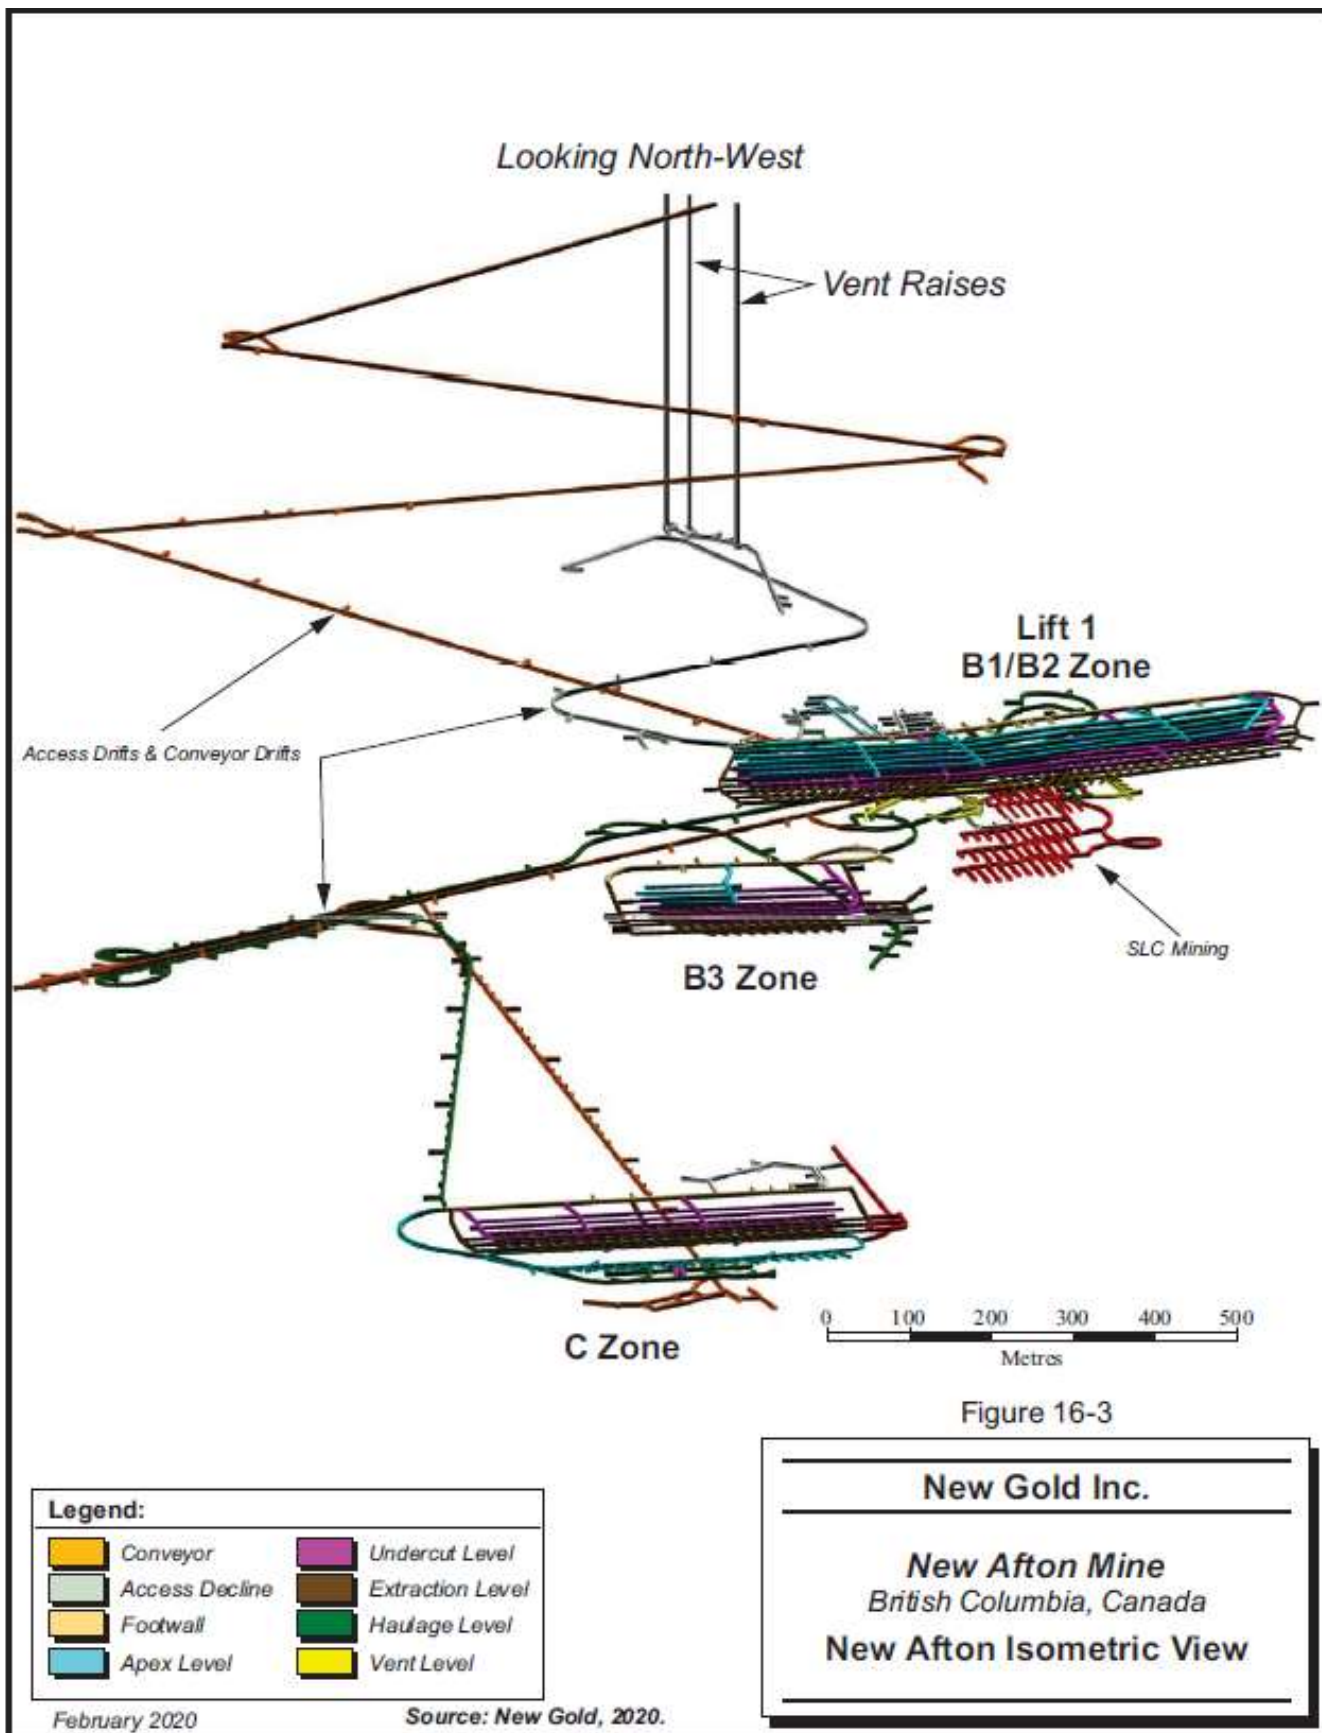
Underground layout of New Afton Mine (RPA, 2020)
